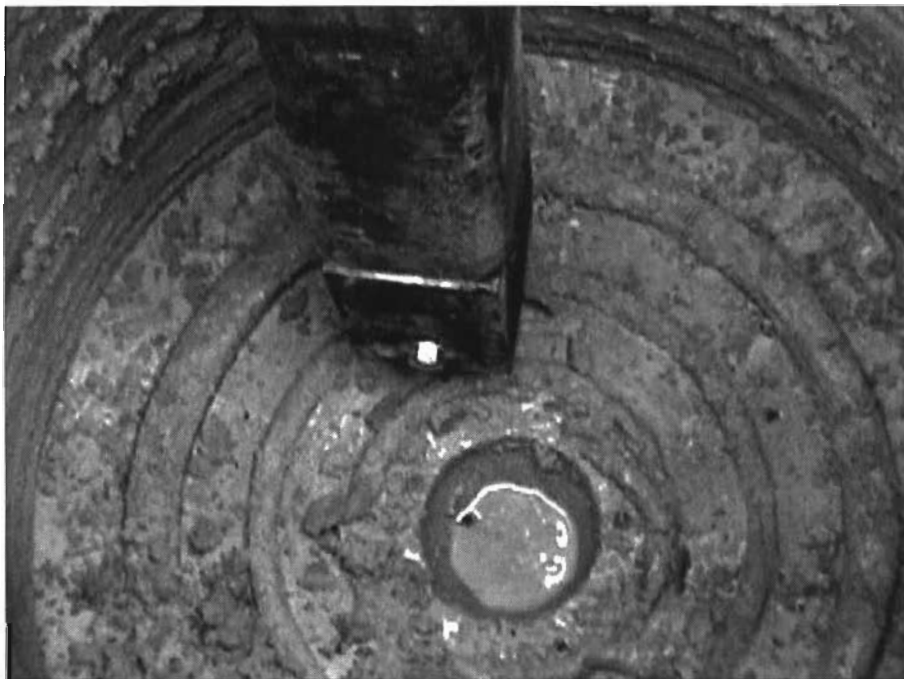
Static Penetrometer Mounted on Kelly Being Pushed by Weight of Kelly at the Bottom of a Drilled Shaft Borehole
